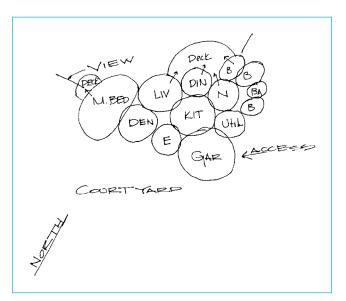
Bubble designs are the first drawings in the design process. These drawings are used to explore room relationships.
